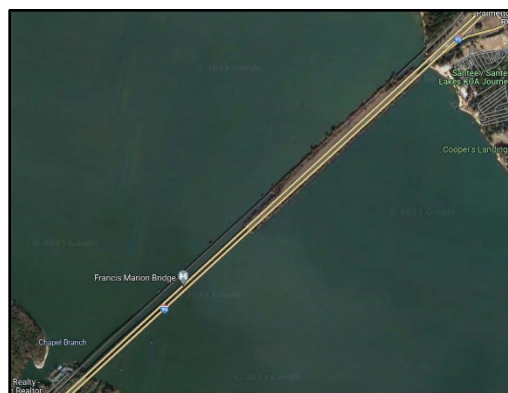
Northbound I-95 over Lake Marion Overflow Bridge in Clarendon & Orangeburg Counties, SC.
